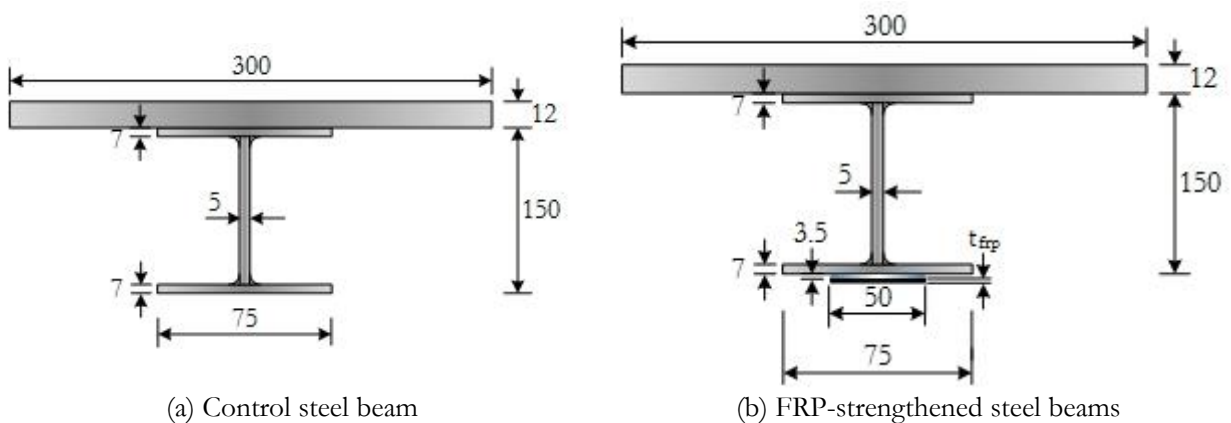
Cross sections of tested beams (all dimensions in mm).
